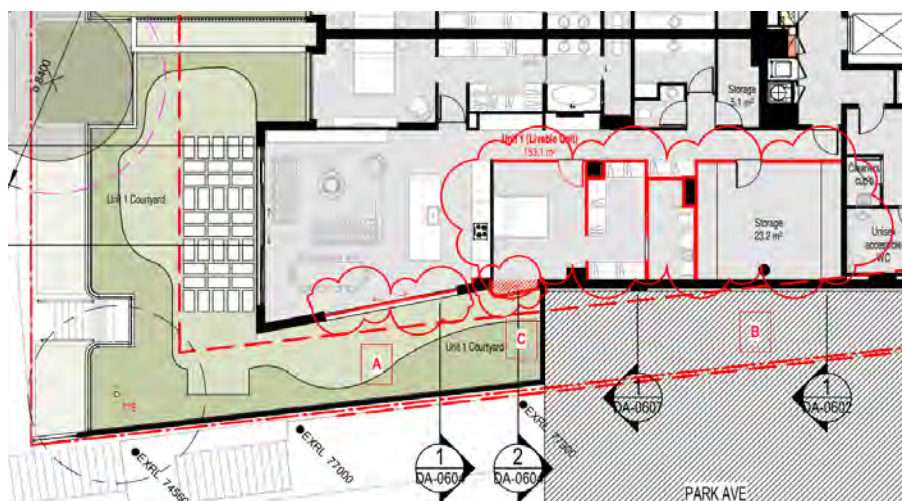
Proposed Unit 1 Plan (DA432/2021/5)
